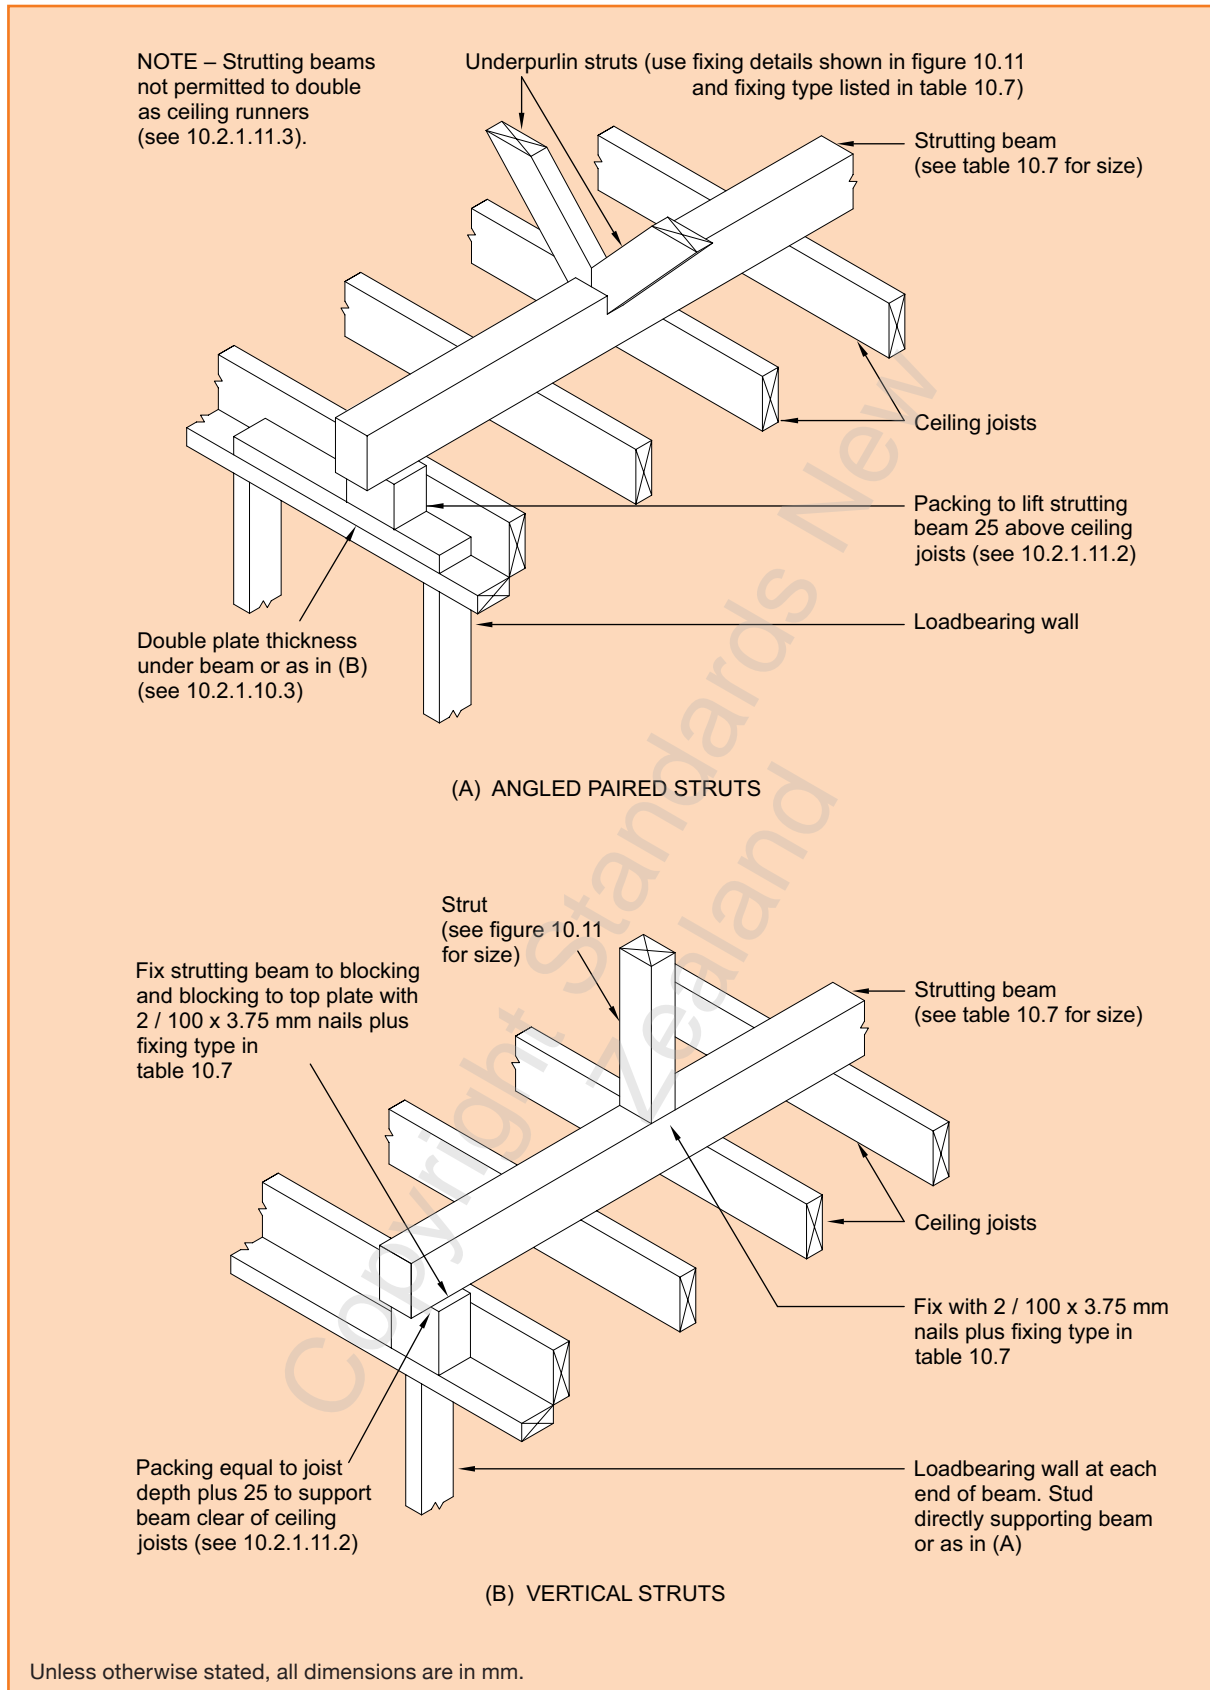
Strutting beams (see 10.2.1.11.1)
